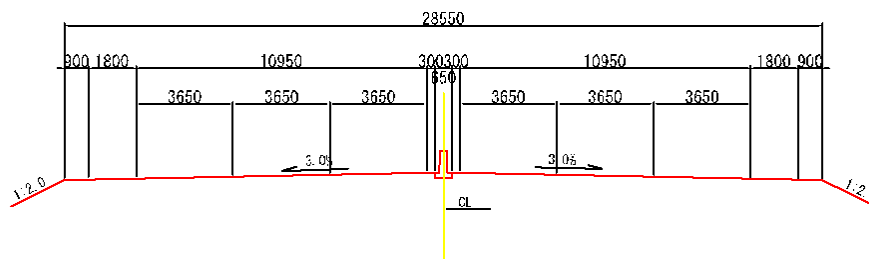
Typical Cross Sections of New and Existing Kanchpur Bridge
